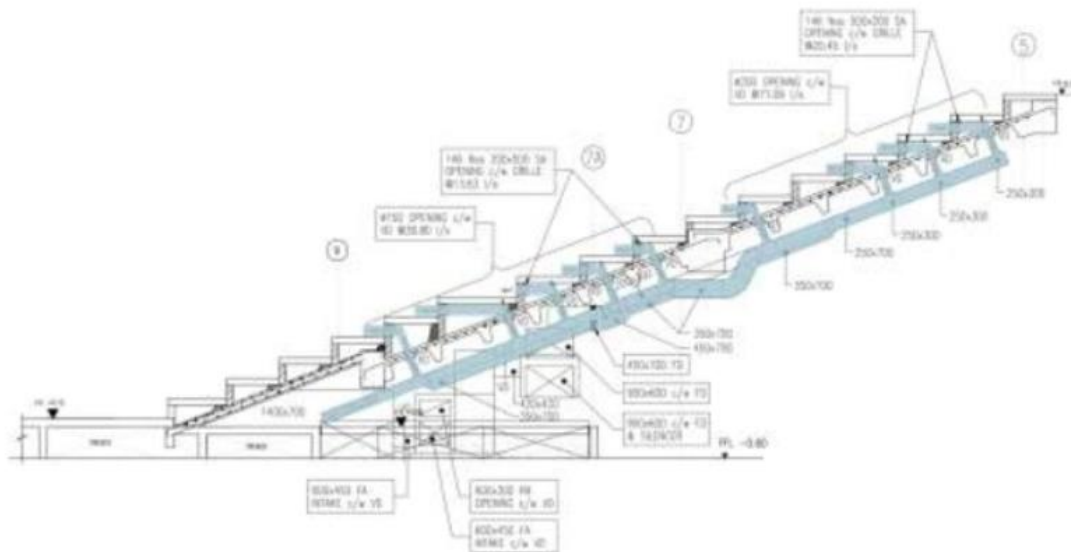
Detailed sectional drawing of the supply air grille behind the seating of the main performance stage
